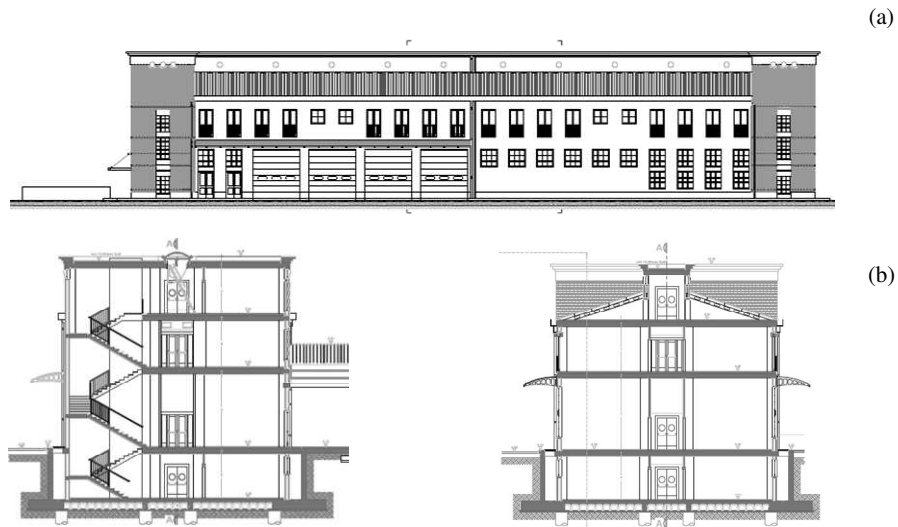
Building 1: (a) East façade, (b) sections in East-West direction.
